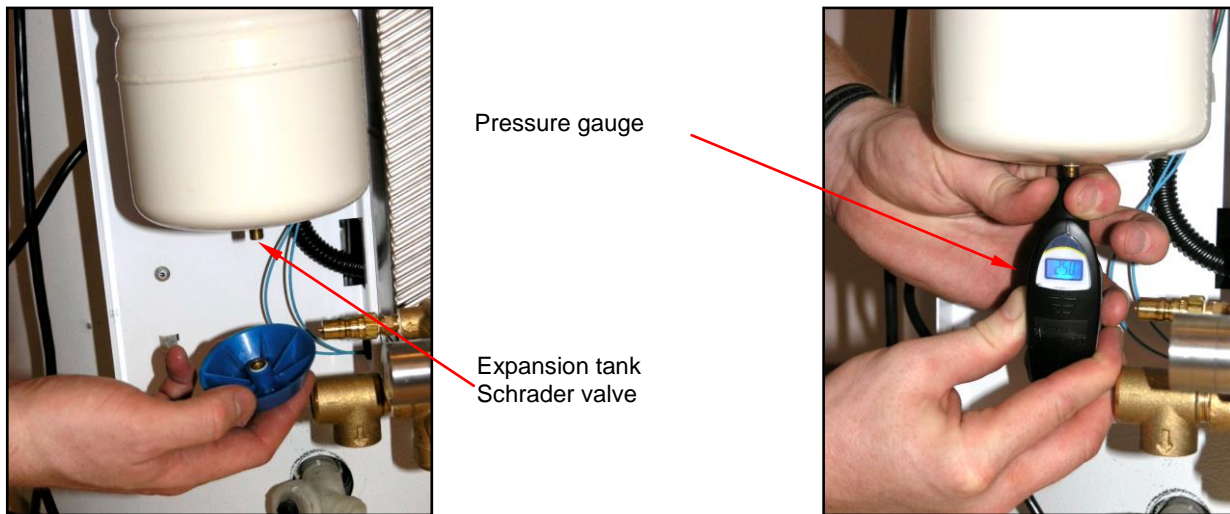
Expansion tank Schrader valve and pressure measurement.
